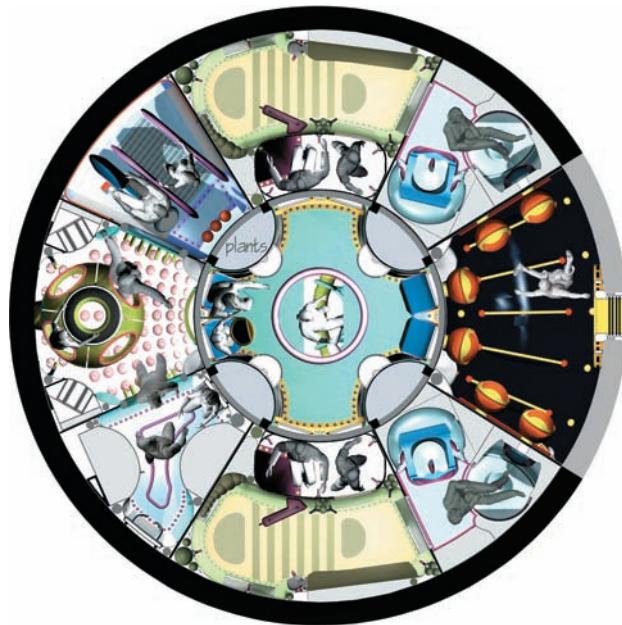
Third-level floor plan: left—restaurant; and right—bar-fun zone with window.
